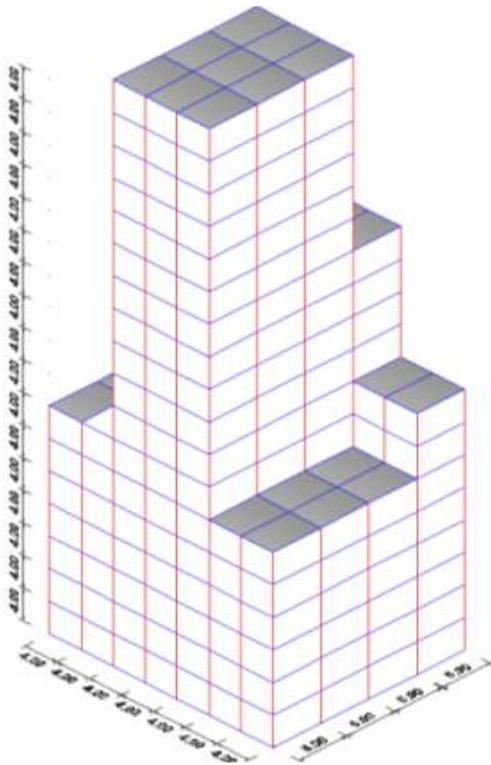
Main dimensions of the Irregular Building composed of steel structure and reinforced concrete slabs
